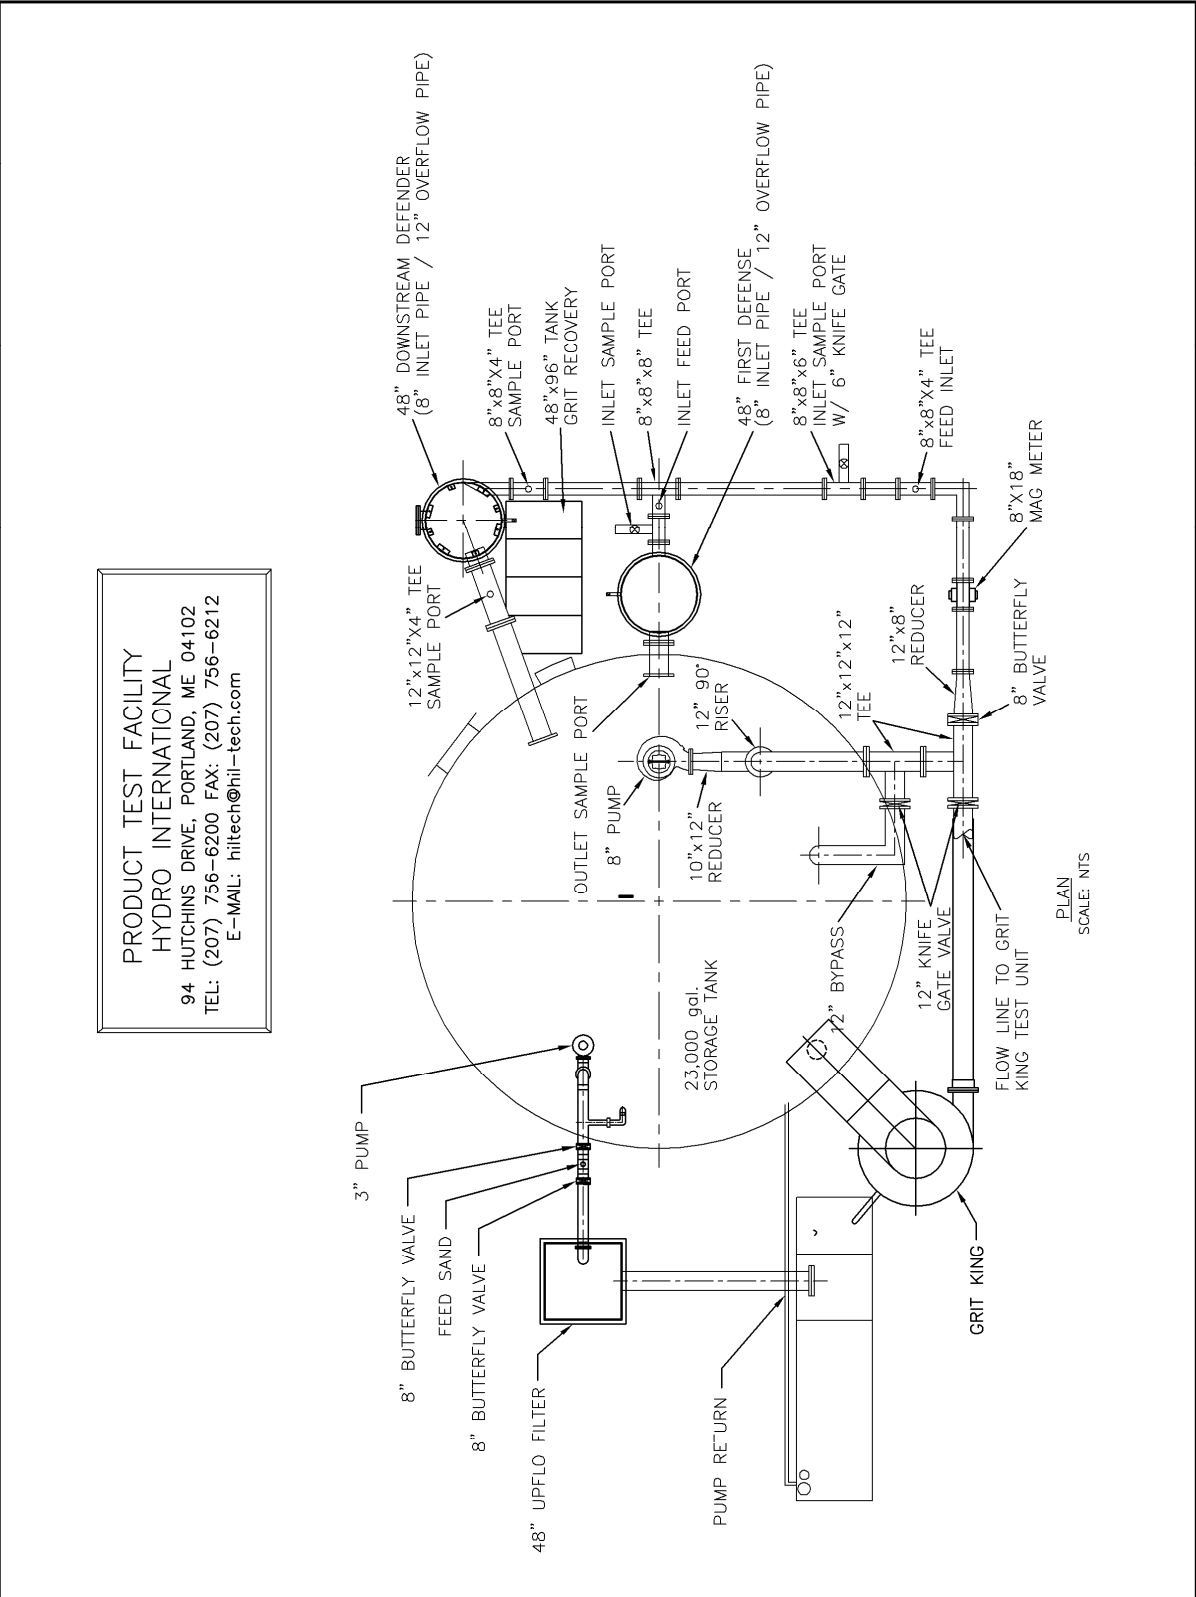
General Arrangement drawing of the Hydro International hydraulic testing facility in Portland, Maine
